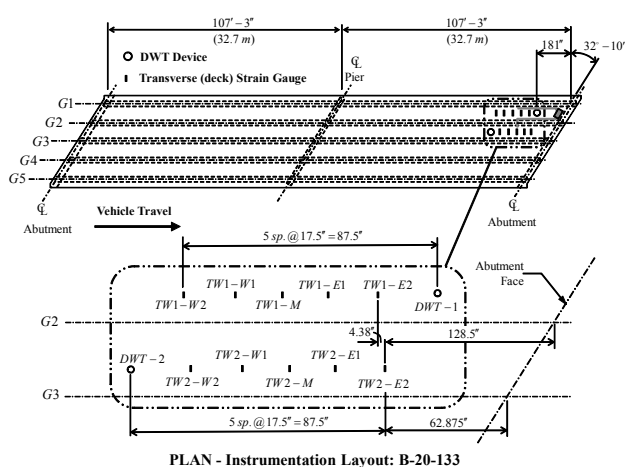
Instrumentation layout for B-20-133 (1 in. = 25.4 mm)
